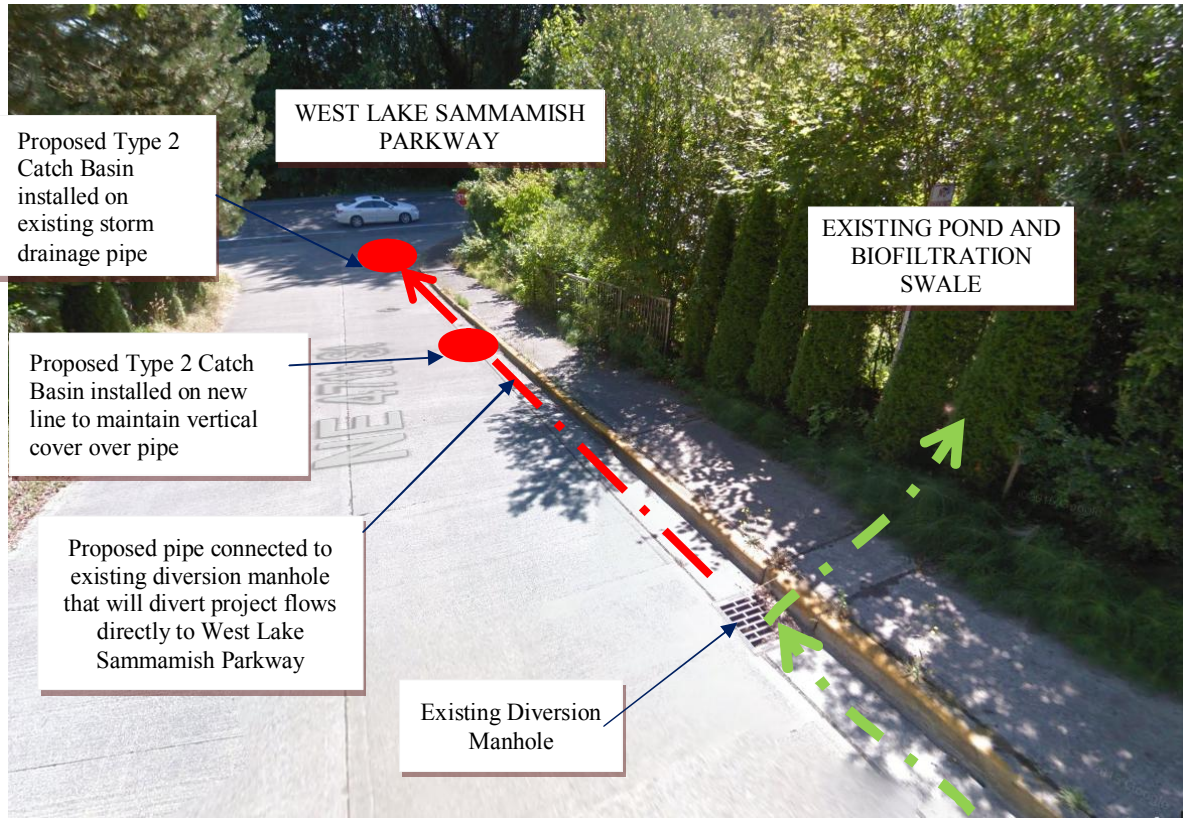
Duke's Landing Proposed Downstream (looking east along the NE 47th Street)
